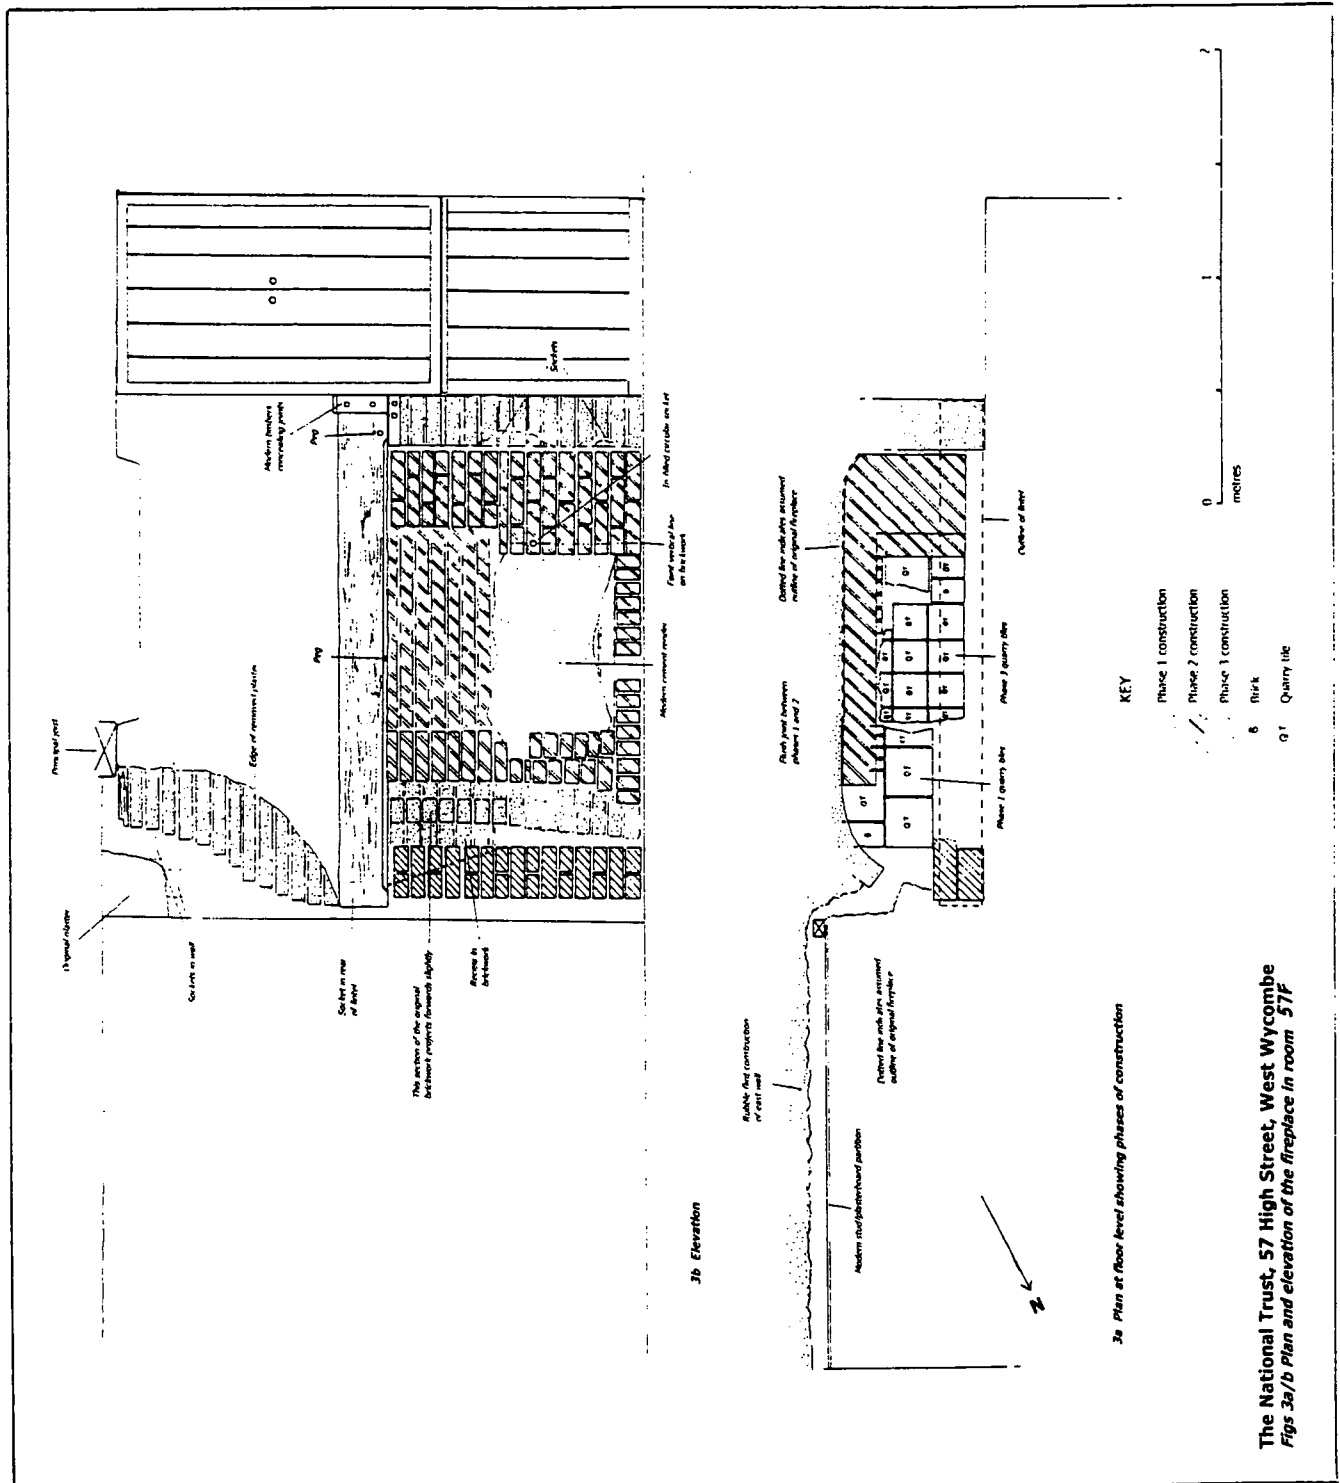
57 High Street, West Wycombe. Plan and elevation of the fireplace in room 57F.
